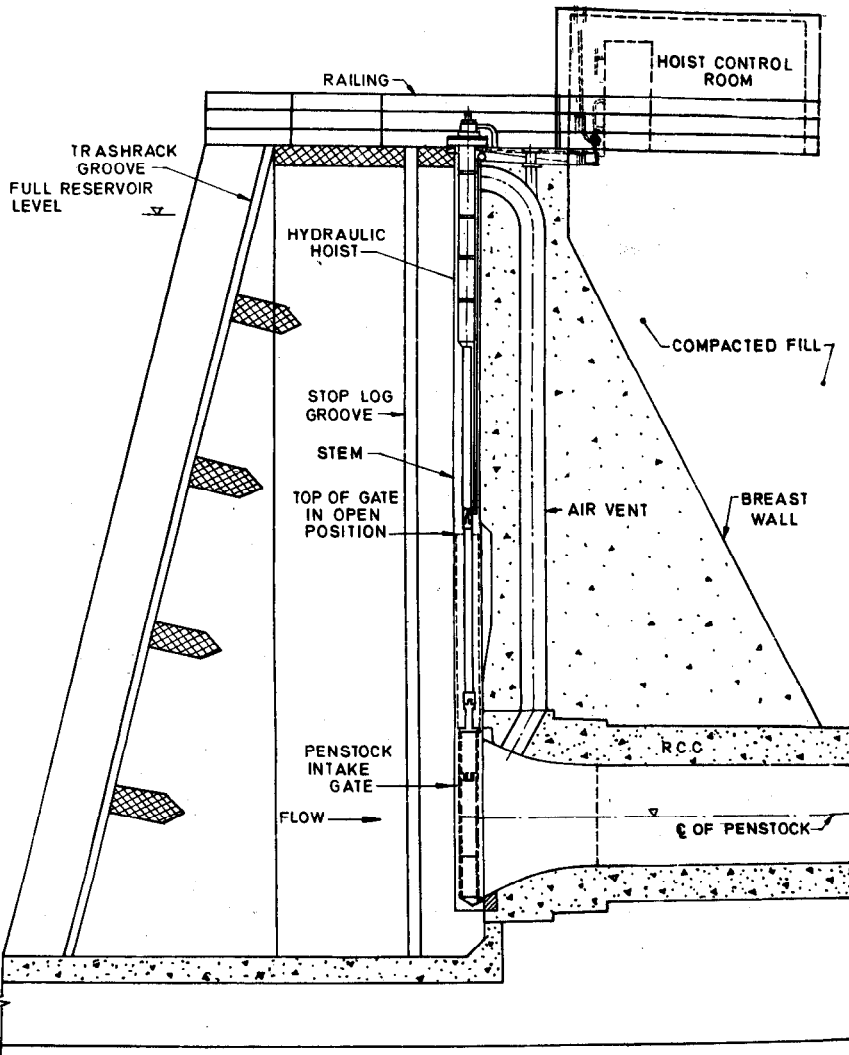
TYPICAL INSTALLATION OF HYDRAULIC HOIST AT PENSTOCK INTAKE GATE
